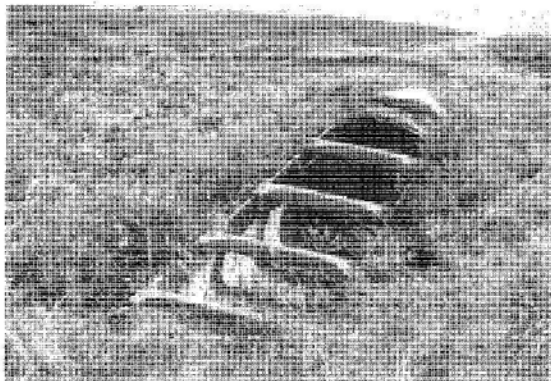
Safety Treatment for Parallel Drainage Pipe
